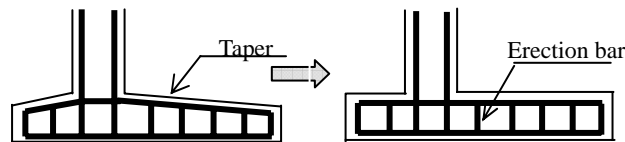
Elimination of the taper on the top surface of the footing of a reverse T-shape retaining wall
